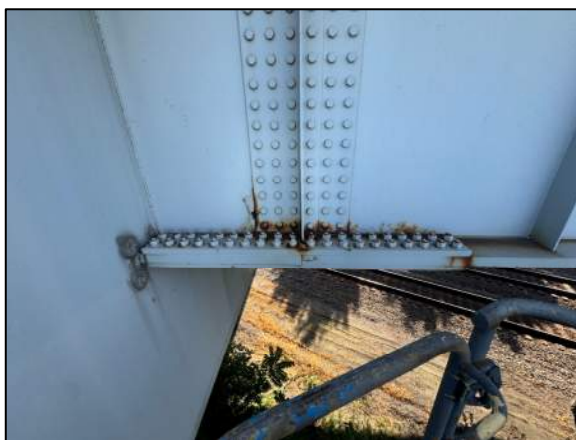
Bubbling paint and corrosion on the west face of Girder 1 extending onto the south web of Pier Cap 16
